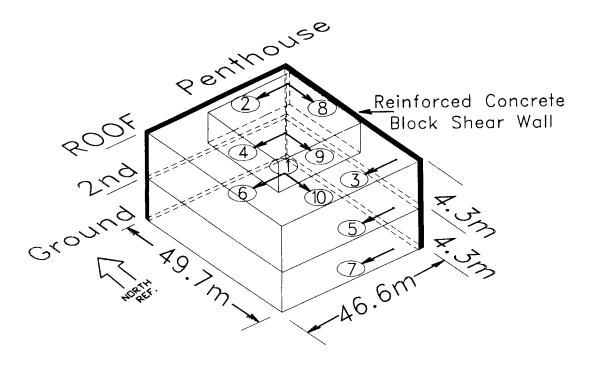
Three-dimensional schematic of two-story building in Oakland.
